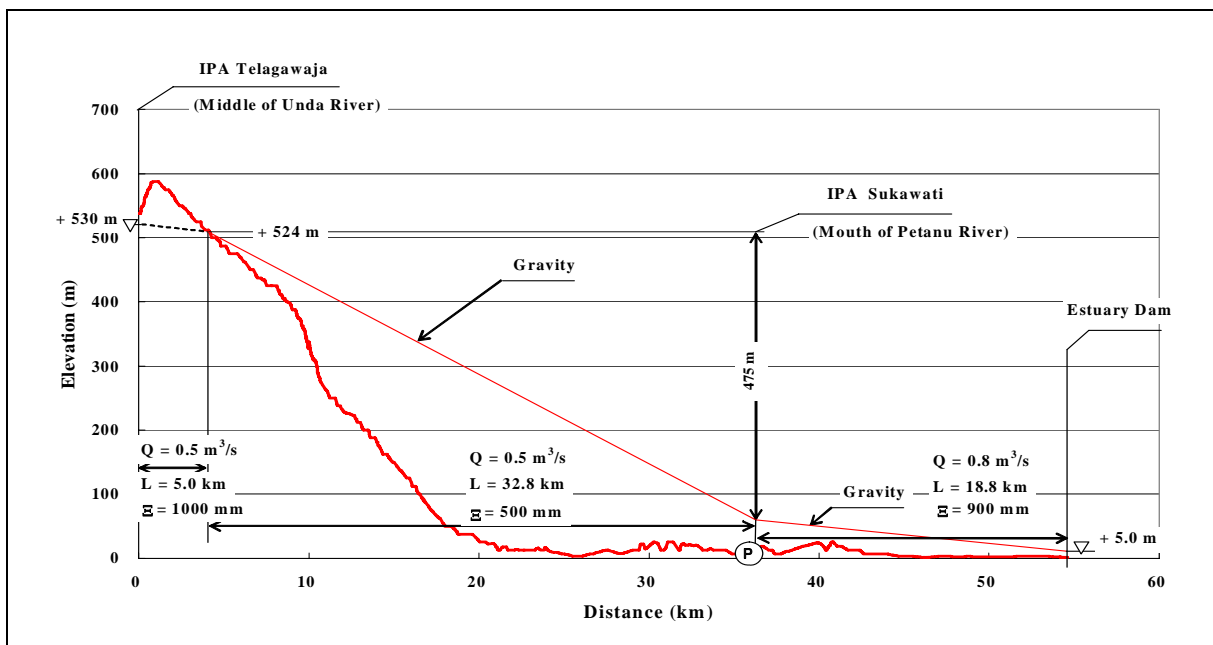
Longitudinal Section and hydraulic Gradient Line of Alternative E5
